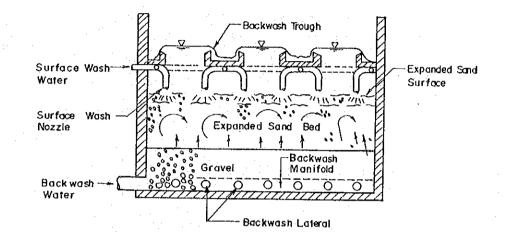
Backwashing with Surface Wash Water (Ref. Book No. 4)
